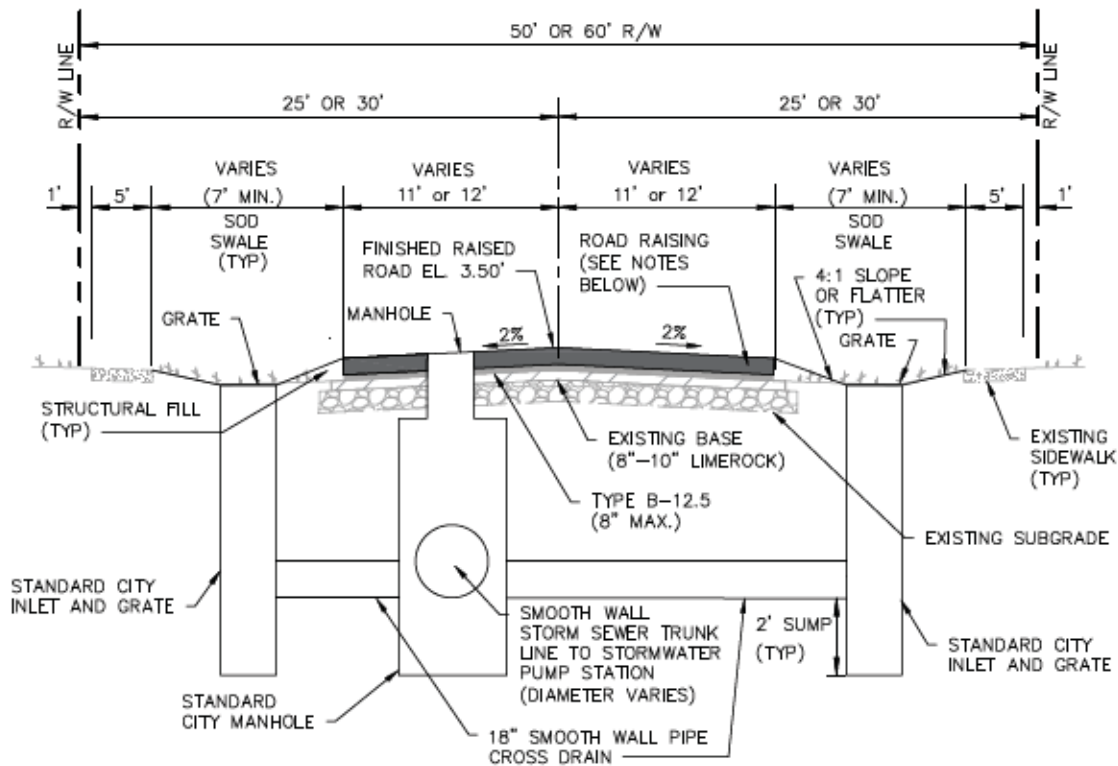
Raised Crown of Road and Added Drainage Profile
